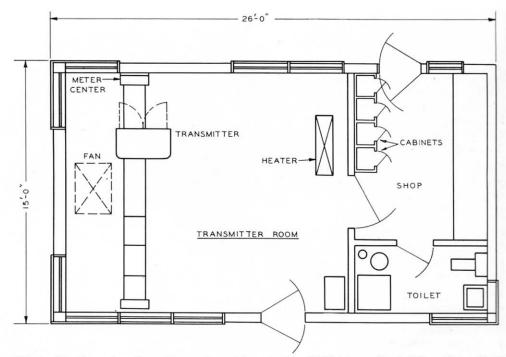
This floor plan shows the equipment layout of the WHHM transmitter building. Note exhaust fan is mounted in the ceiling near the transmitter. WHHM finds this layout adequate except that it lacks sufficient storage space.
